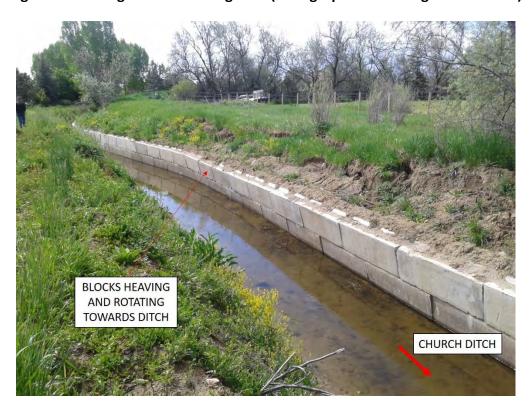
Headgate 53 Retaining Wall (Facing Upstream Along Church Ditch)
